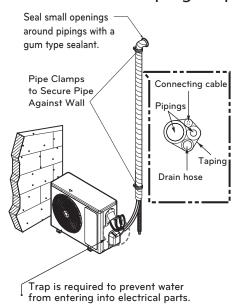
Cutaway of Proper Pipe and Cable Bundling
